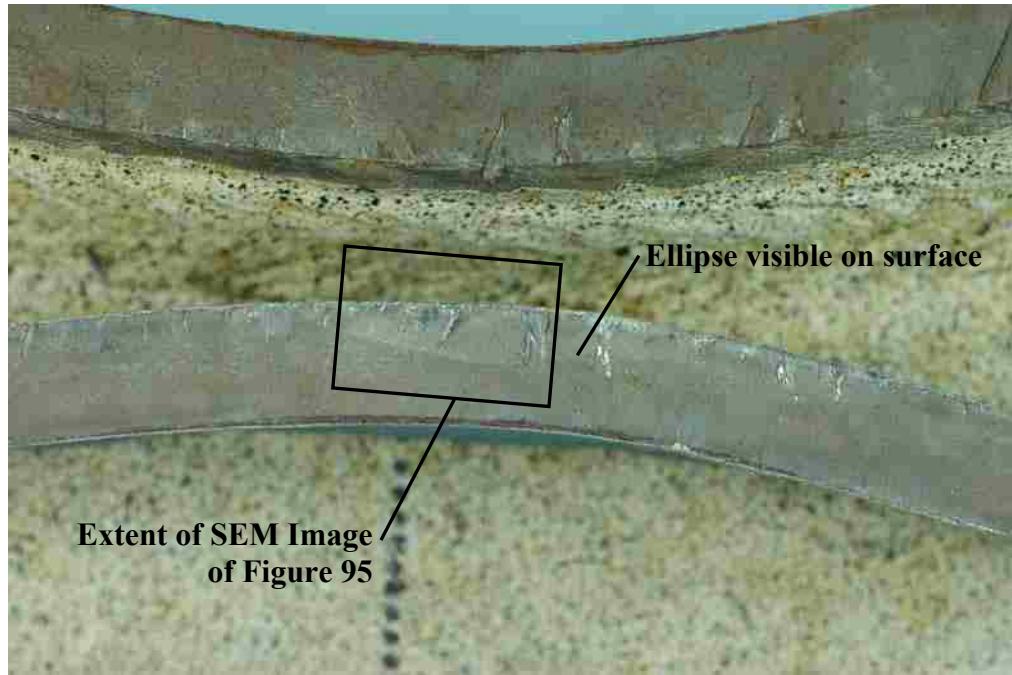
Specimen XII-1 fracture surfaces at pole base
